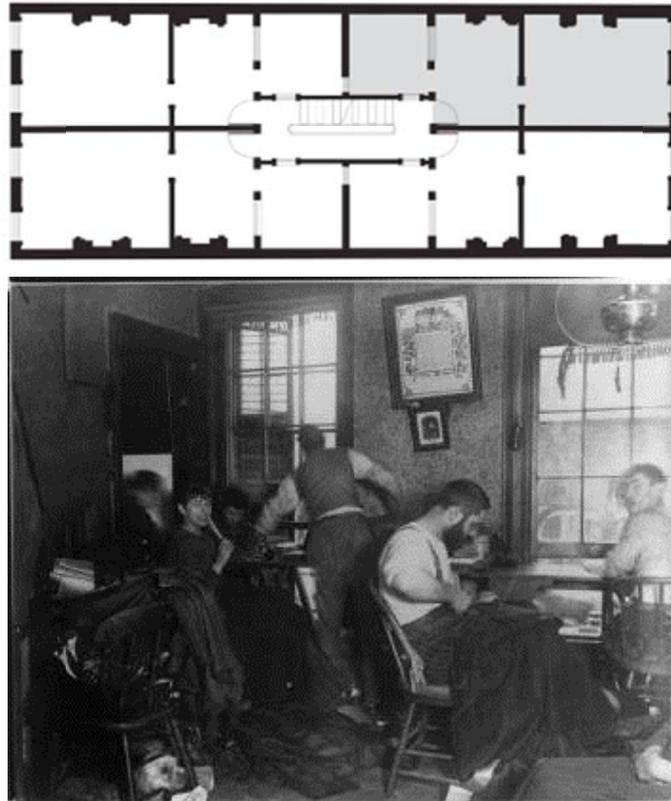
New York tenement floor plan (1864) and sweatshop (1889)
